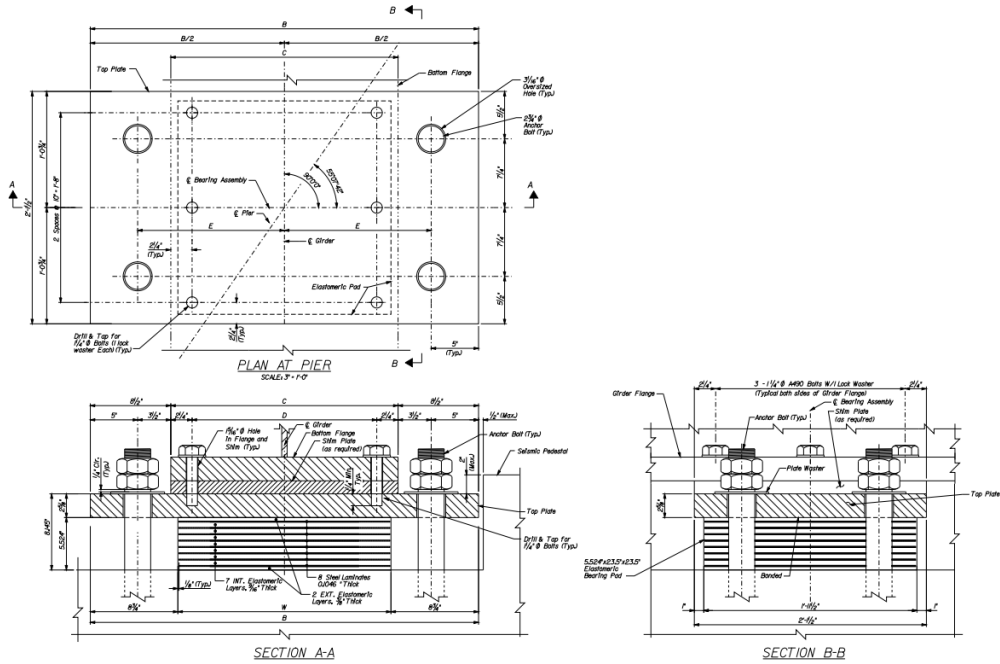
Bearing Pad Assembly at Pier 2 for Structure I69-057-09506 (NBI 80226) (INDOT, 2010)
